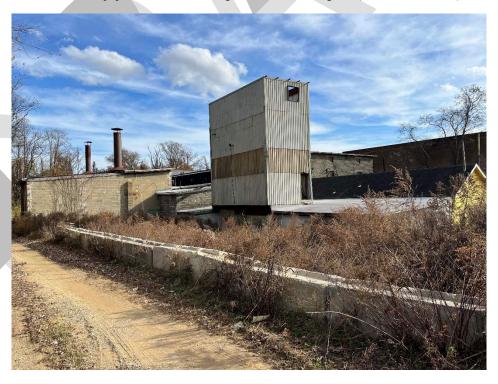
Exterior view of the Still House (right) and attached distillery equipment rooms (left), camera facing southeast (November 17, 2023).
